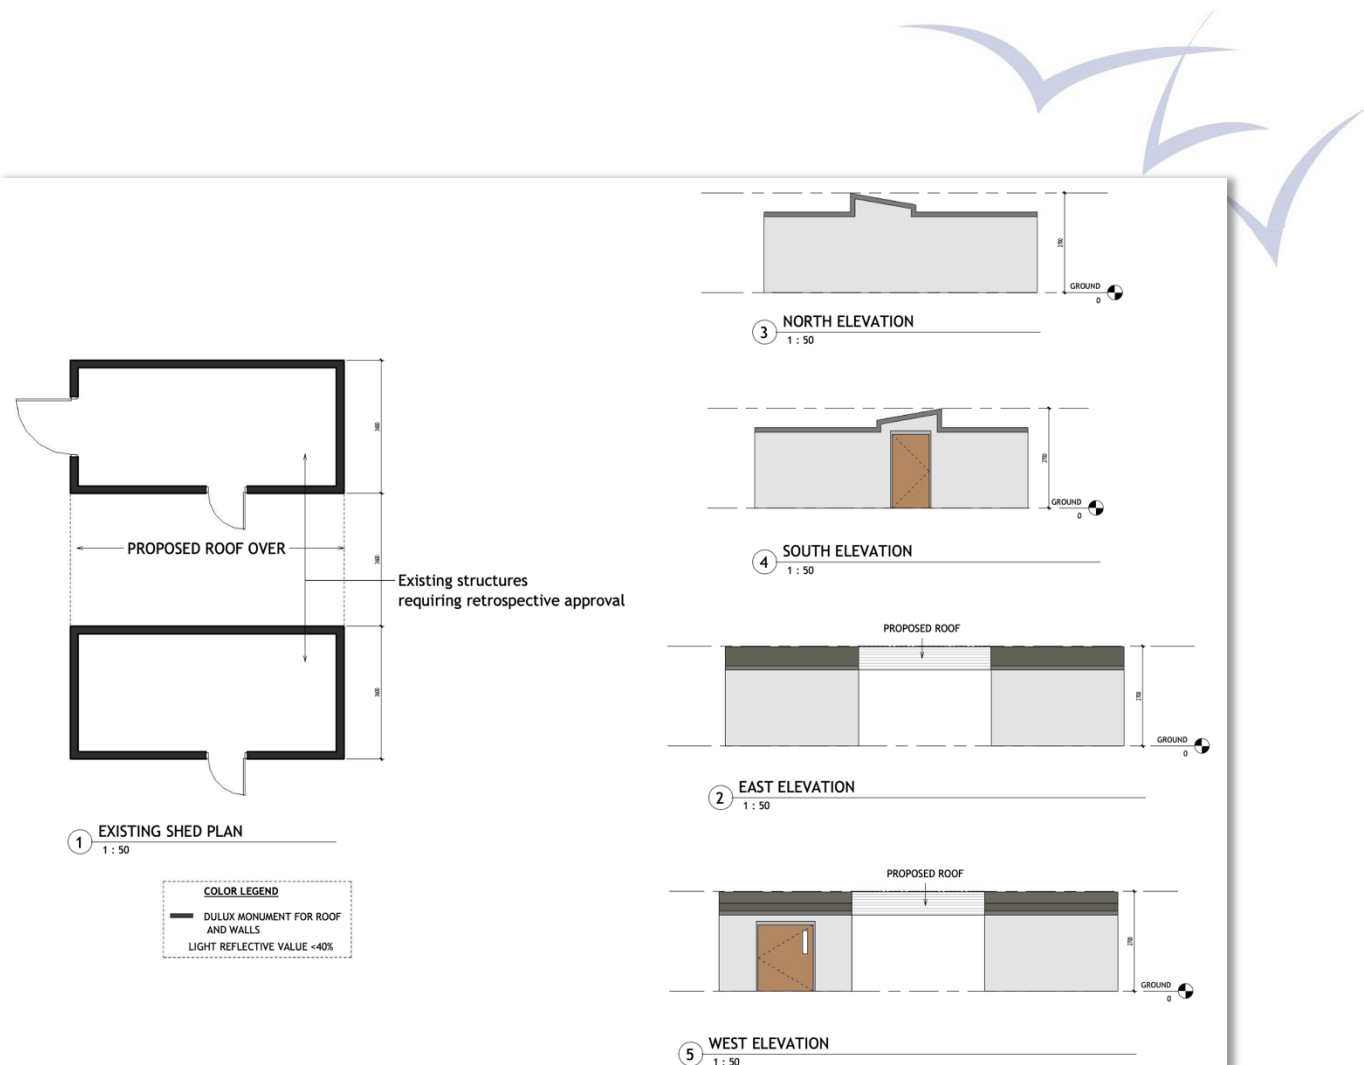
Shed 2 – existing shipping containers without approval are to remain on site. A new roof is proposed.
